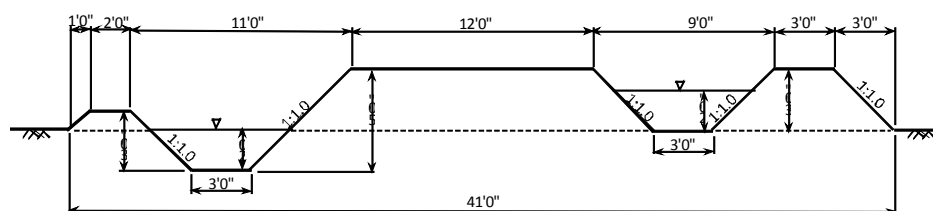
Typical cross section of Main Canal, Road and Drainage
